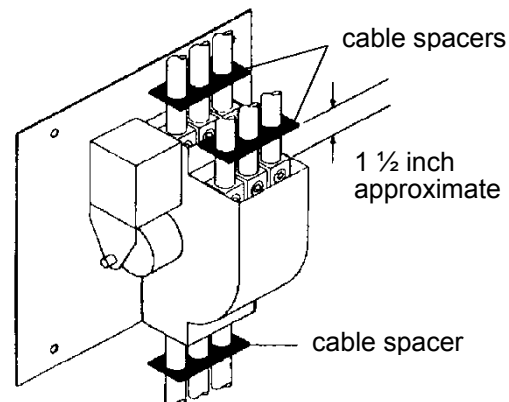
Cable spacers for 150, 200, and 230 ampere transfer switches.
